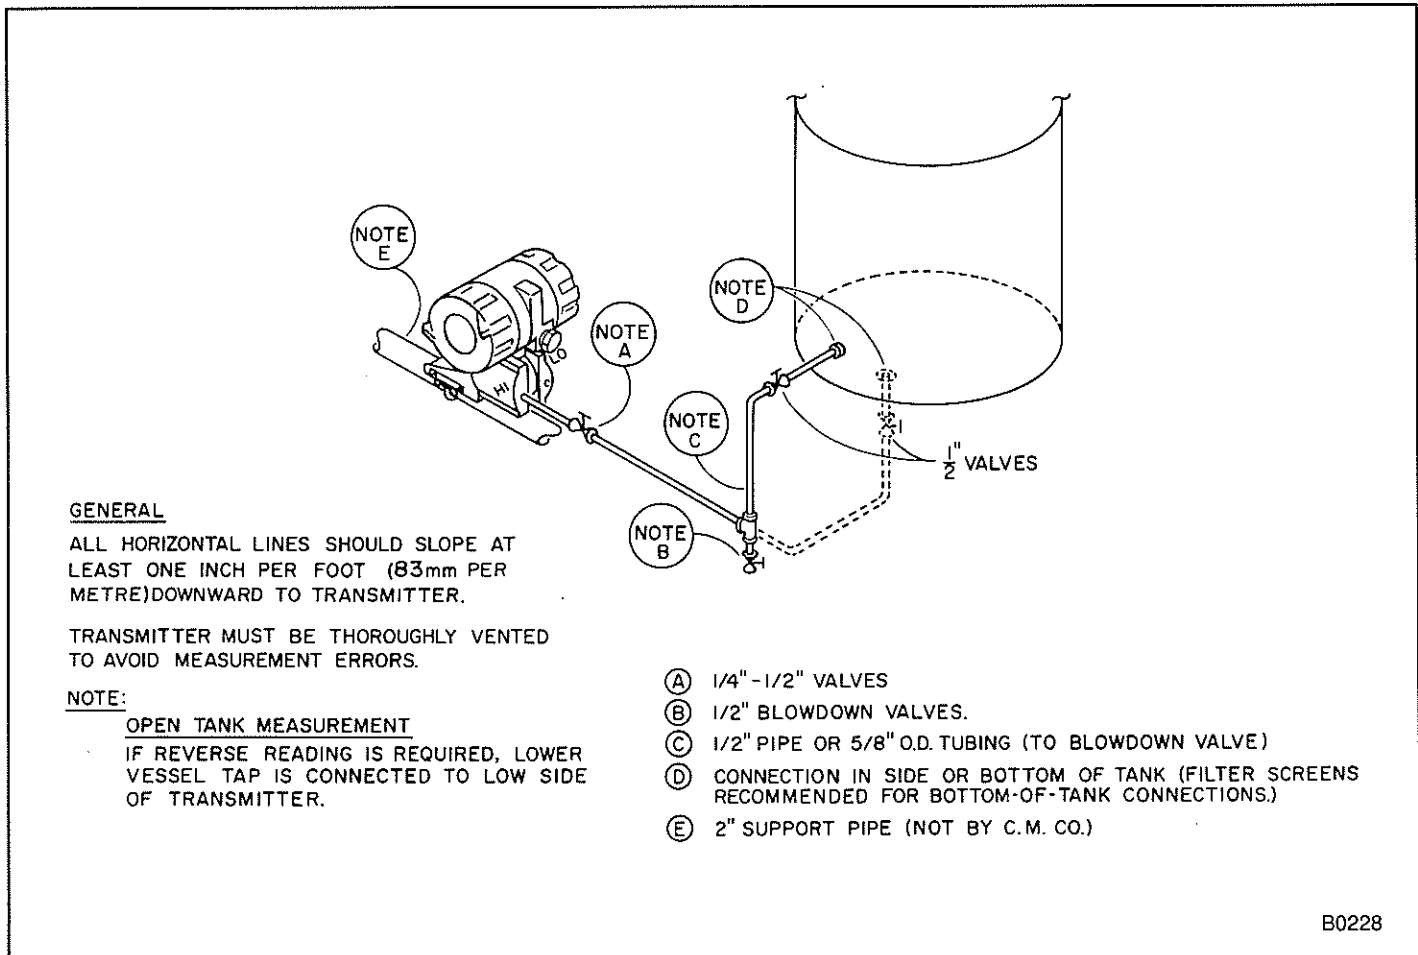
Connecting Piping for Open Tank Level Measurement
